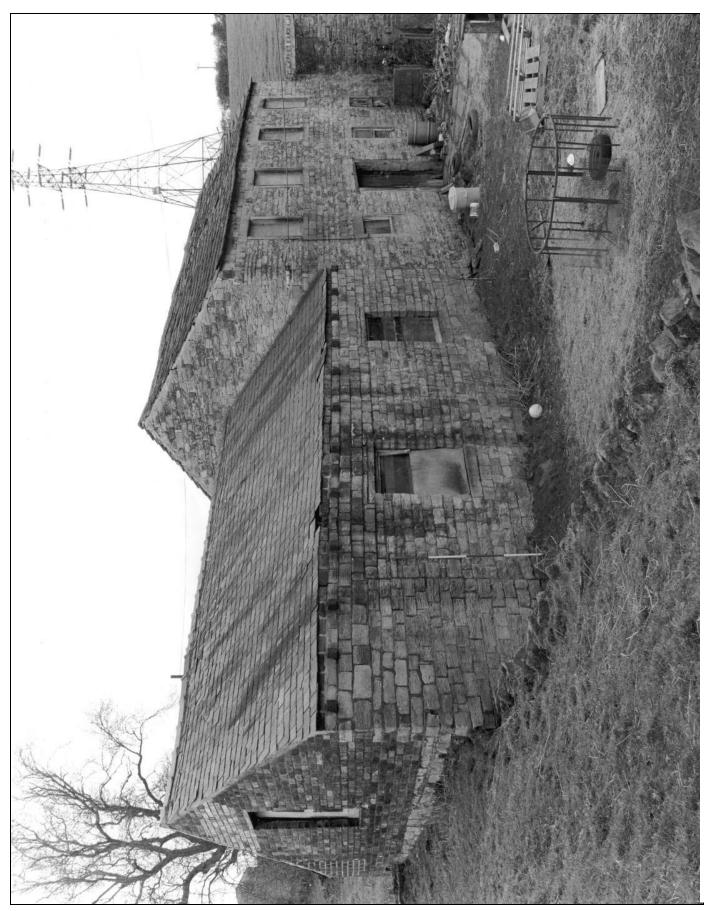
Building 1: general view, from the south (film 1, frame 6)
